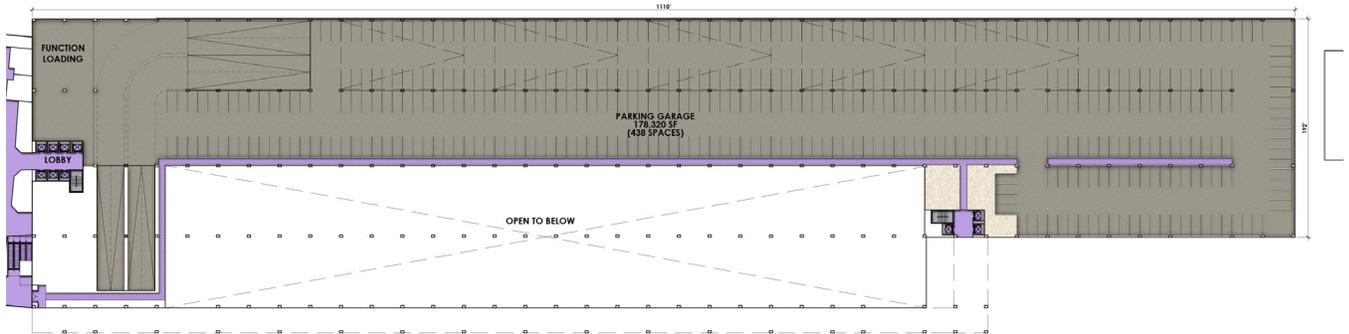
a-34 Plans for Parking Structures - Garage Grade Levels 3-9 Typical Plan
